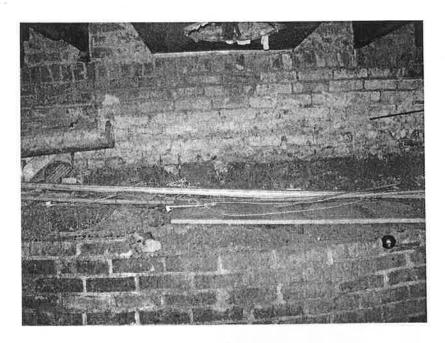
Figure K. West exterior bearing wall in original additional above partial basement elevation with signs of moisture seepage.
